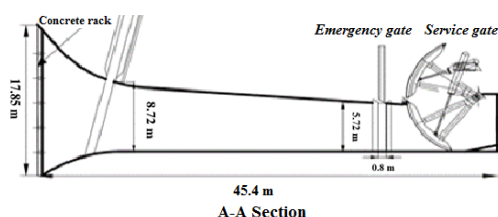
Longitudinal section of No. (1) Seymareh Dam's bottom outlet
